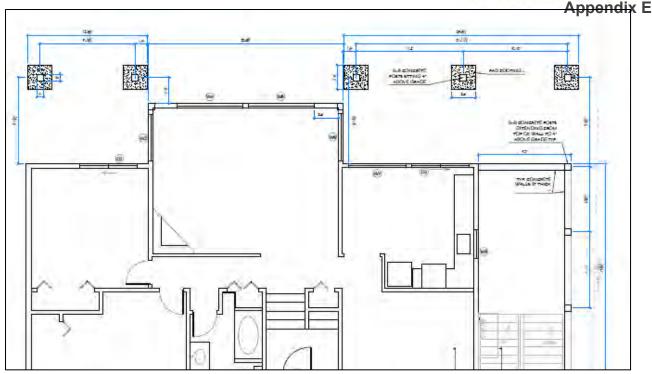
Arial view of the proposed locations of concrete footings (north) and concrete wall (east) for the foundation. Drawings provided by Momentum Design Build.
